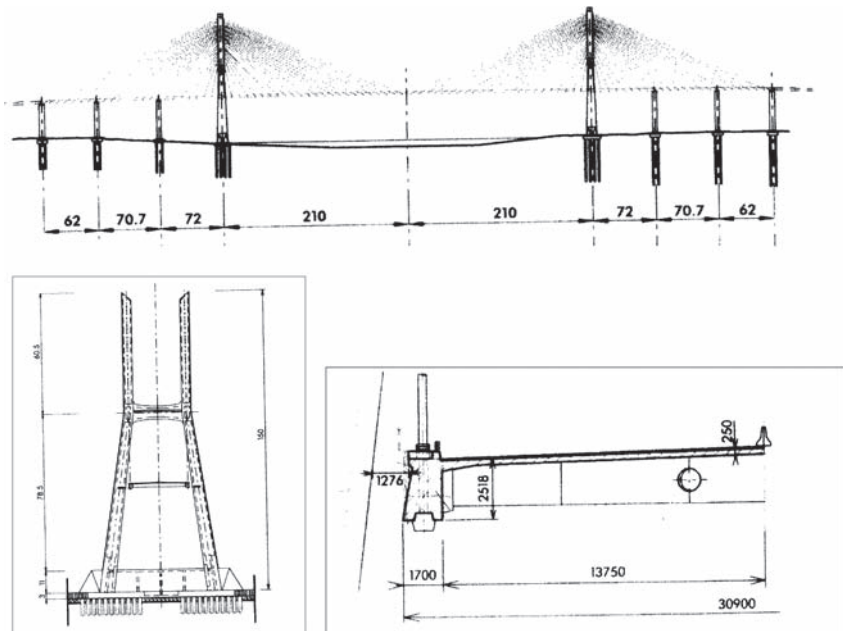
Elevation, tower and deck of the Vasco da Gama Bridge.
